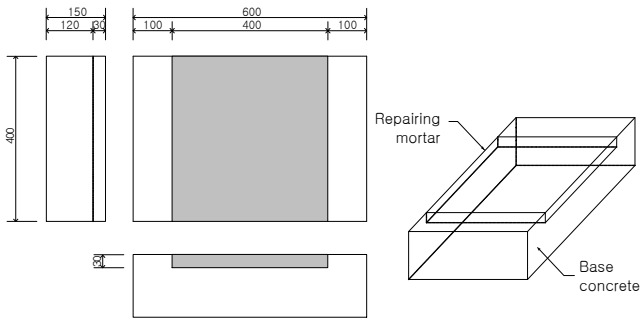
Detail of base concrete for pop-out resisting test(unit : mm)
